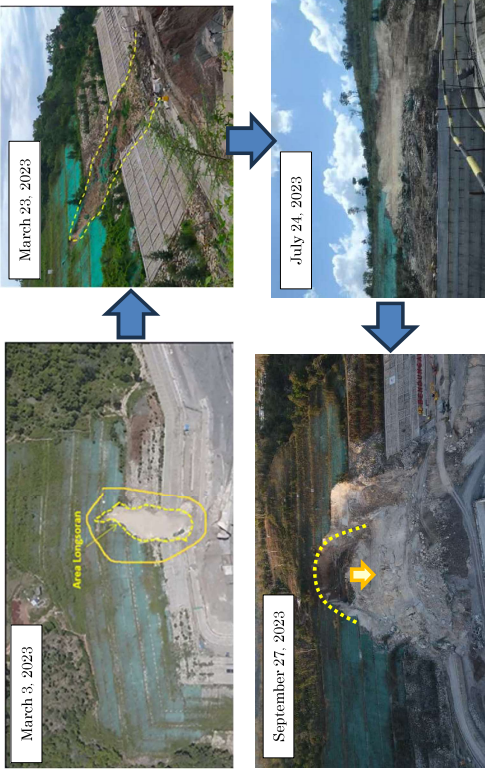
Historical Slope Failure at Left Cut Slope of Spillway, Temef Dam
